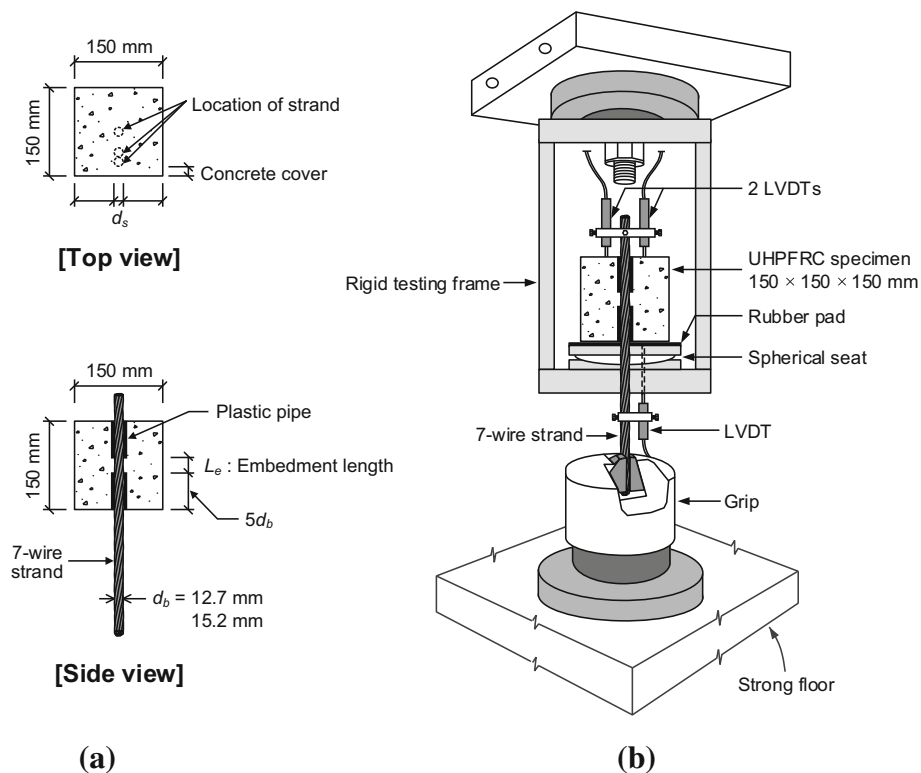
Pull-out test specimen and test setup; a test specimen and b test setup.
